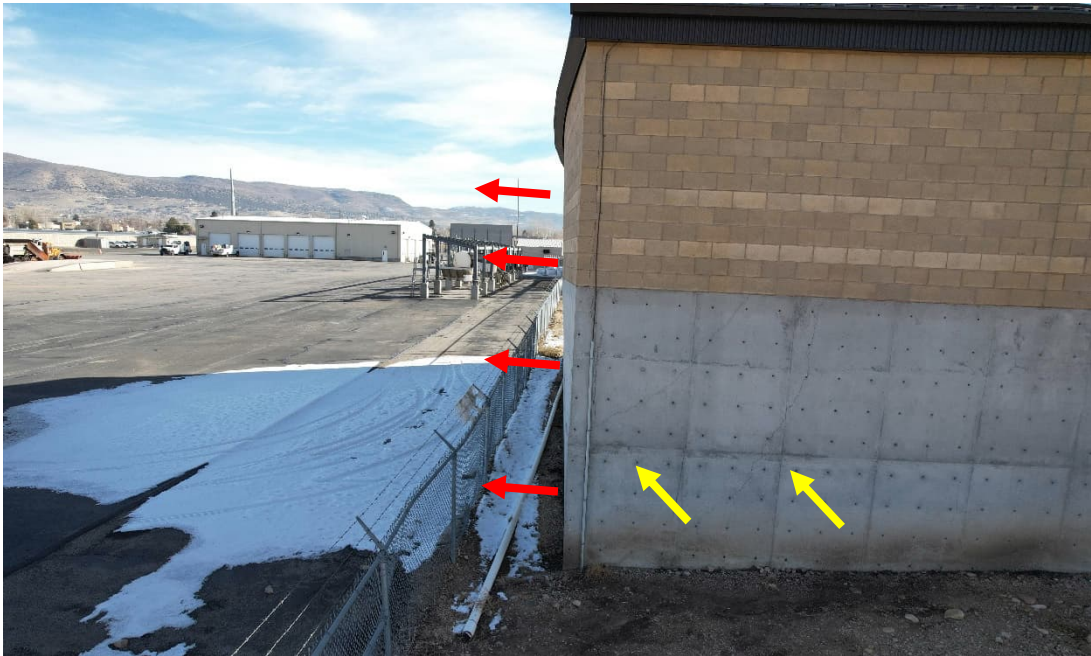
Outward bow of north wall; diagonal fractures in concrete at west wall.
